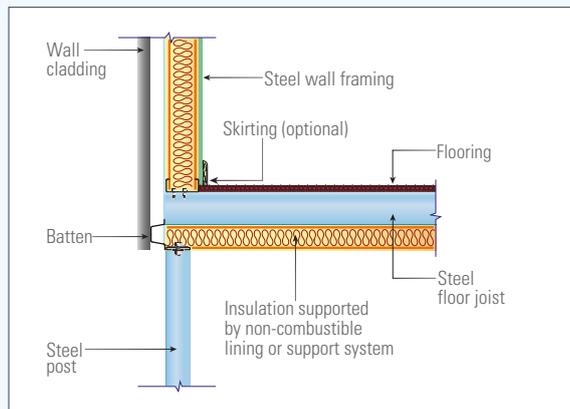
Suspended steel floor system – unenclosed, BAL-12.5 to BAL-40
